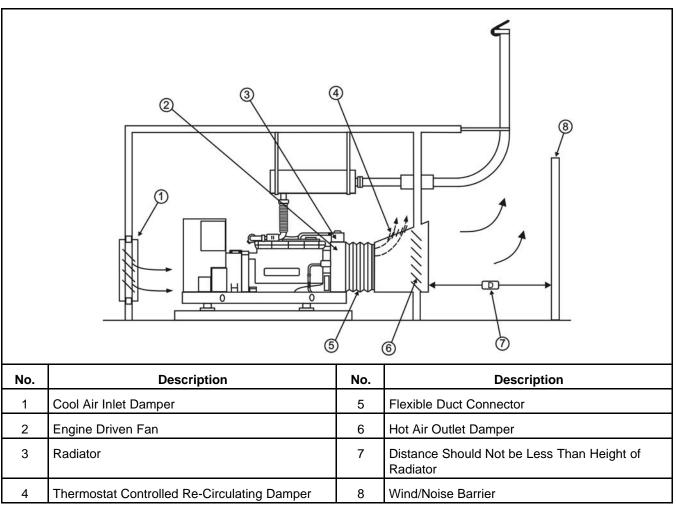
TYPICAL OPEN GENERATOR SET INSTALLATION
